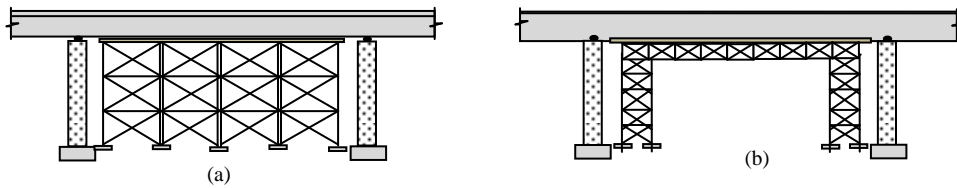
Scaffolding construction methods: (a) scaffolding, (b) falsework
